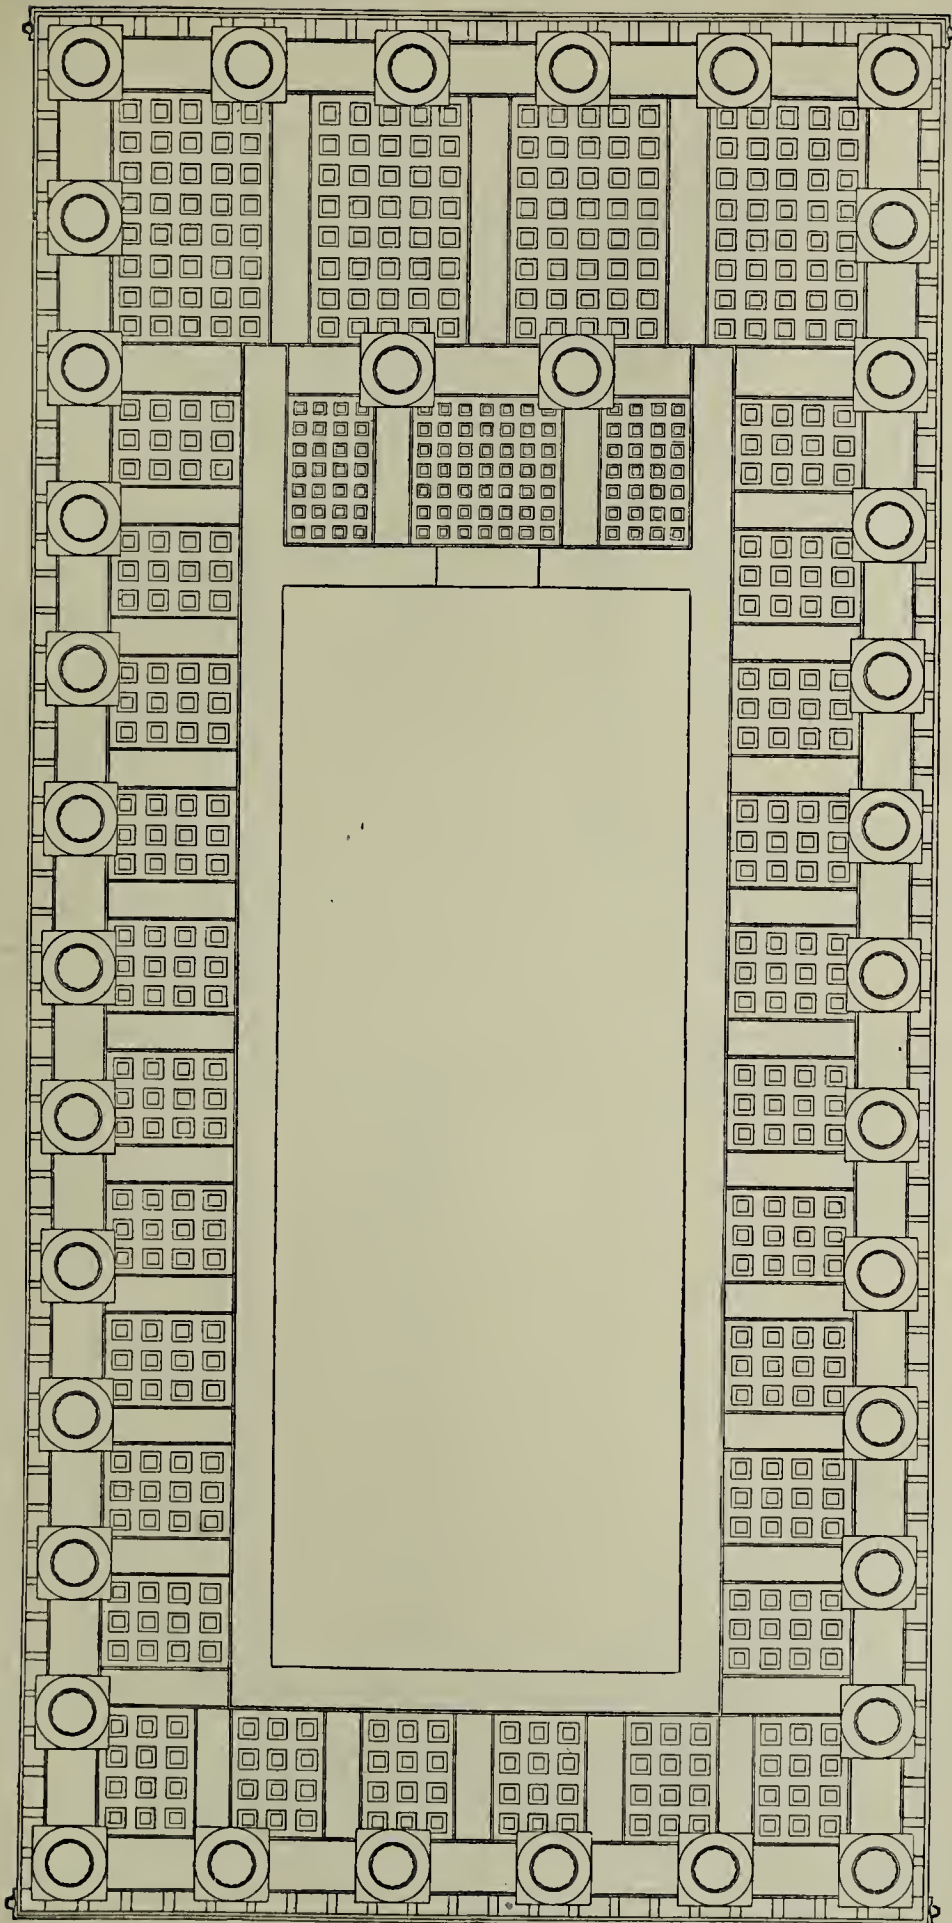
GENERAL PLAN OF COFFERED CEILING.
